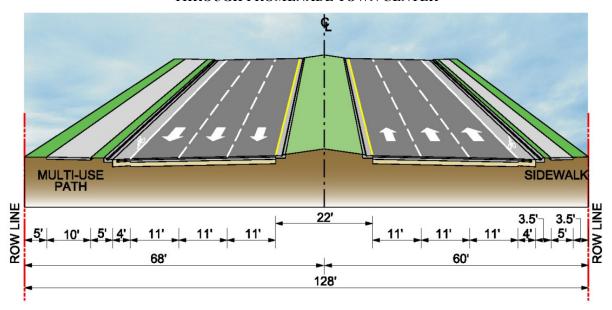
SIX-LANE DIVIDED URBAN TYPICAL SECTION PROMENADE TOWN CENTER TO FORT KING ROAD
